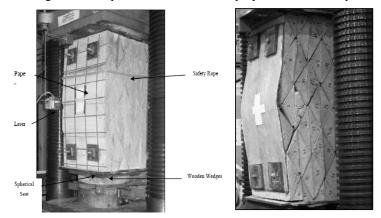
Loading of two concrete specimen supported with steel mesh and reinforced with polymer skin
